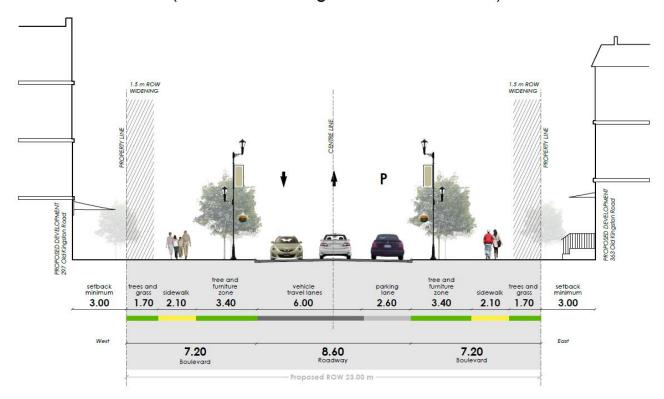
Morrish Road ROW Existing and Proposed (Typical Section)
